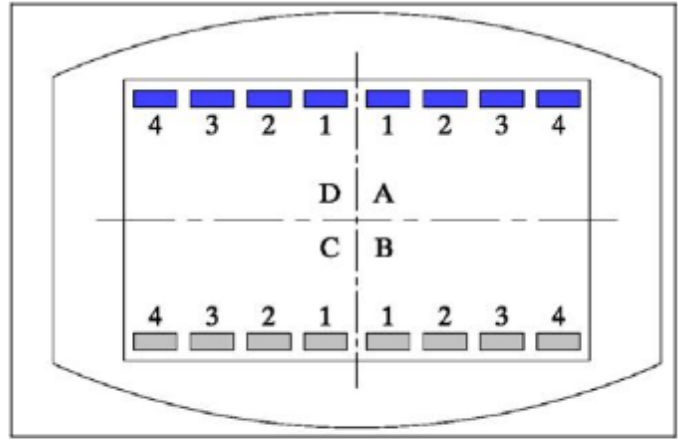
Operable roof and carrier layout. Carriers in blue have linear bearings.
